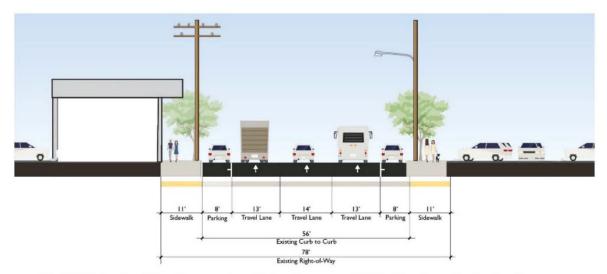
Existing Conditions Cross-section - Hedges Avenue to SR180 - Abby Street (facing North)
